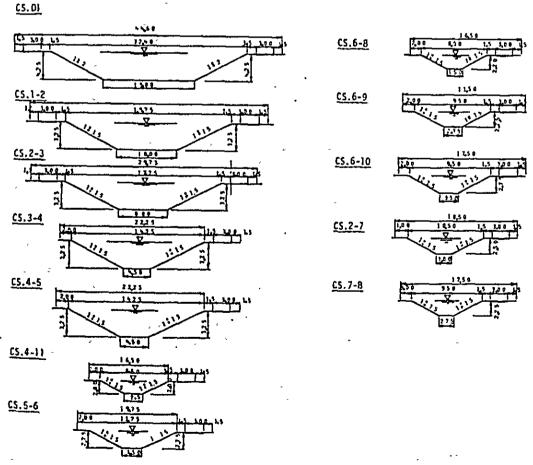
TYPICAL CROSS SECTION OF MACRO AND COLLECTOR DRAINAGE PROPOSED BY PBJR, 1980
